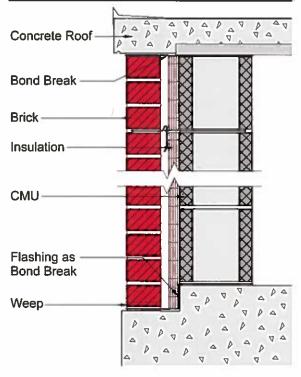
Bond Breaks in Loadbearing Cavity Wall
